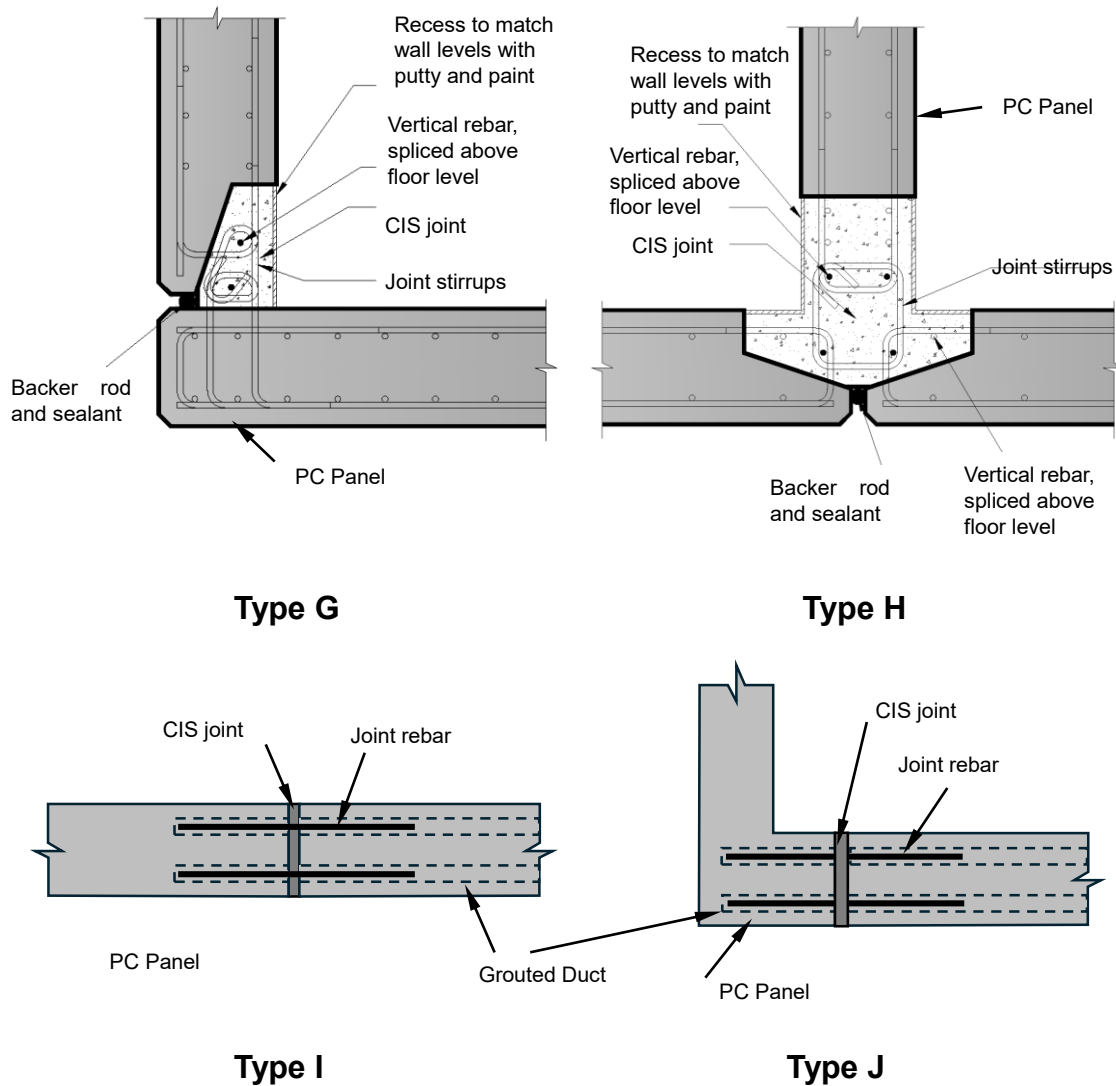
VERTICAL JOINT BETWEEN WALL TO WALL OR WALL TO COLUMN
